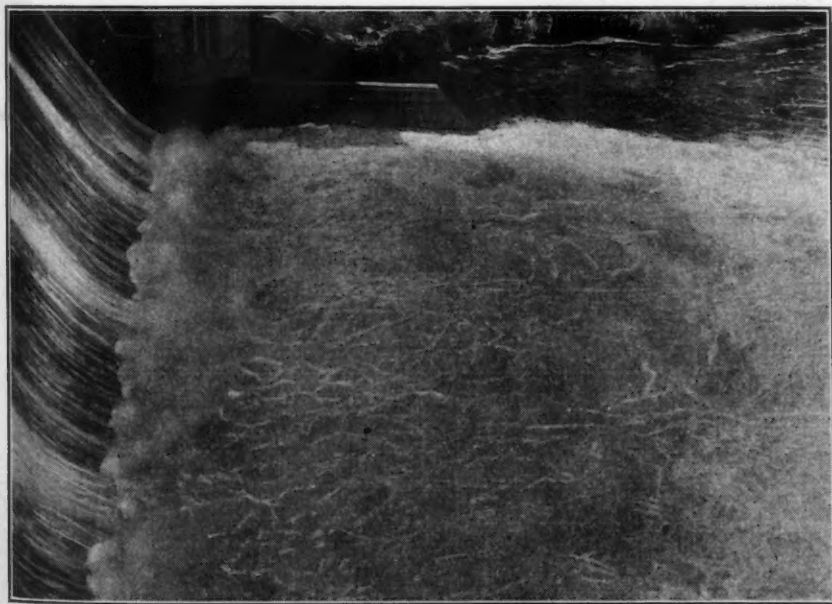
VIEW OF HYDRAULIC JUMP ON SLOPED SPILLWAY; FLOW,
